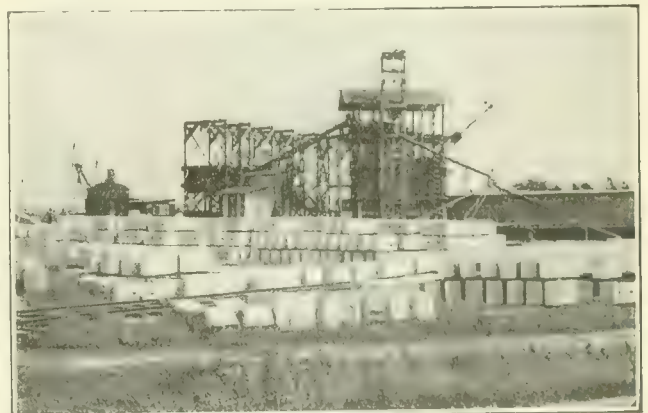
STORAGE YARD AND CONCRETE PLANT
